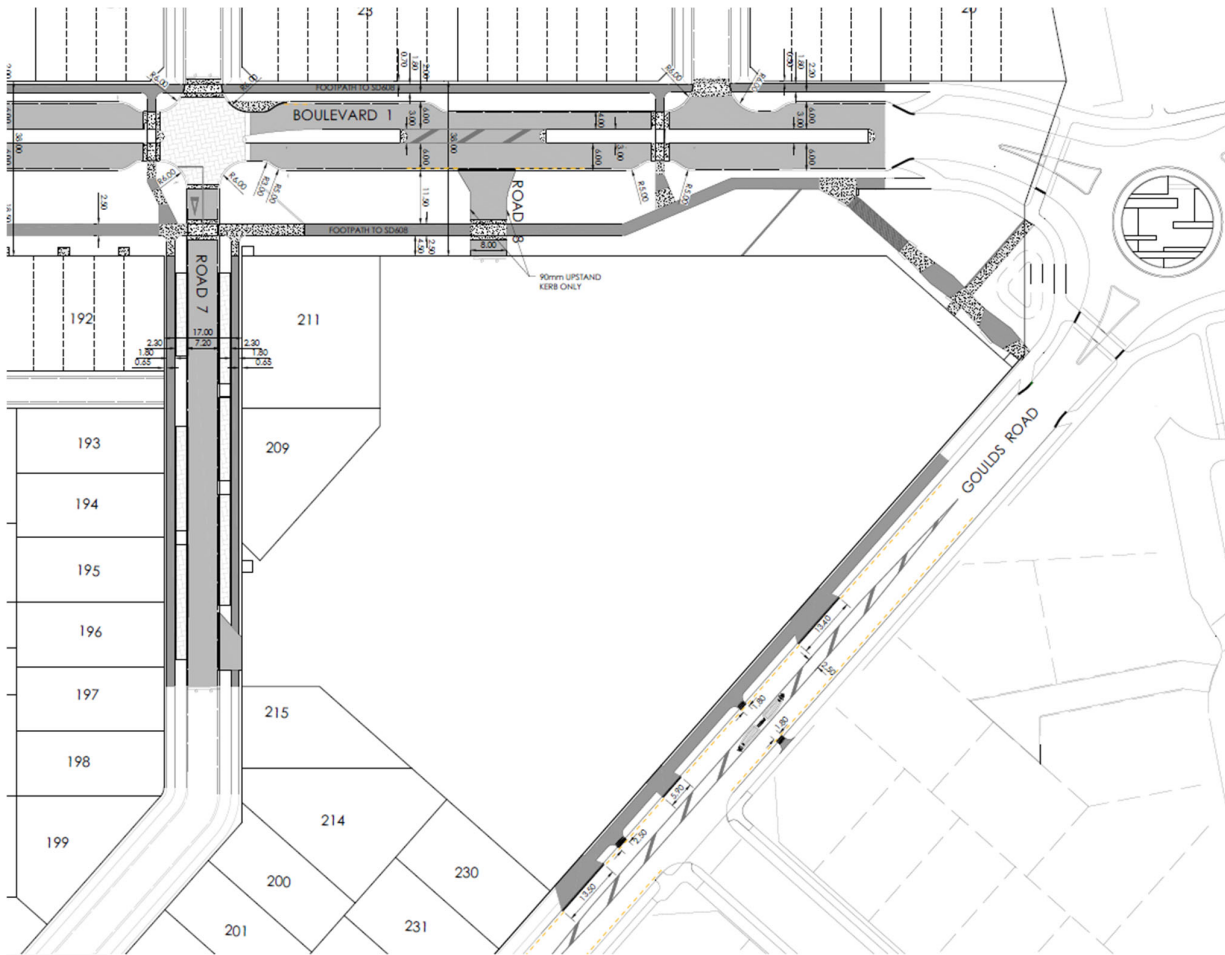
Indicative Road Layout Plans (Work in Progress)
